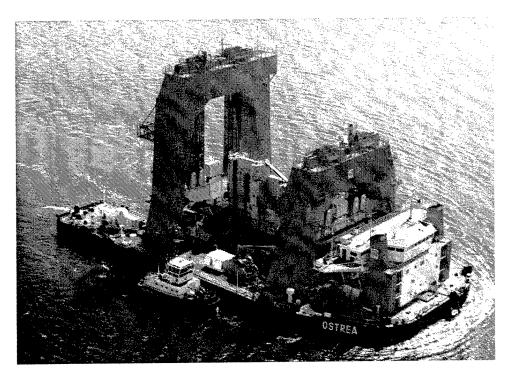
Catamaran carrying a 24,000-ton pier to the Oosterschelde storm surge barrier site
